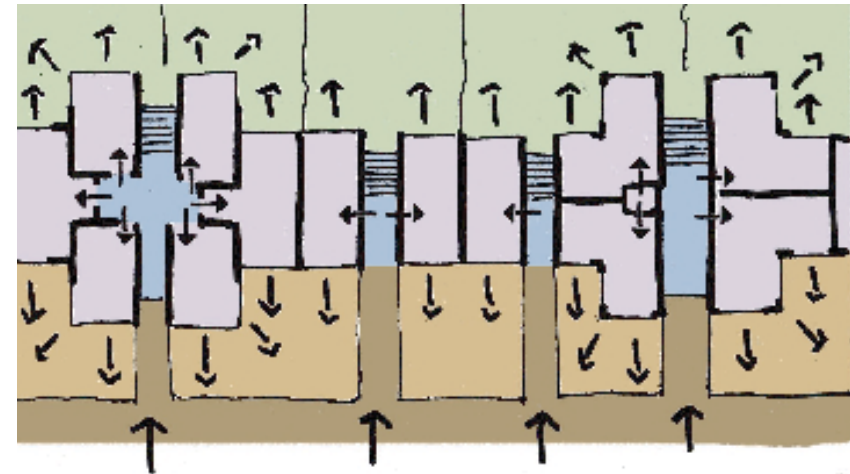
Apartment build providing overlooking of the street and central amenity space
